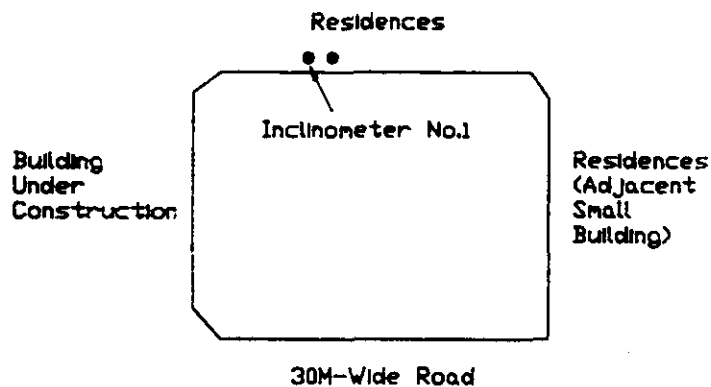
Plan view of excavation site and locations of instruments(Asia cement)
